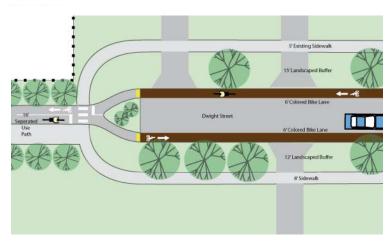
Concept for Riverfront Transition to On-Street Route
